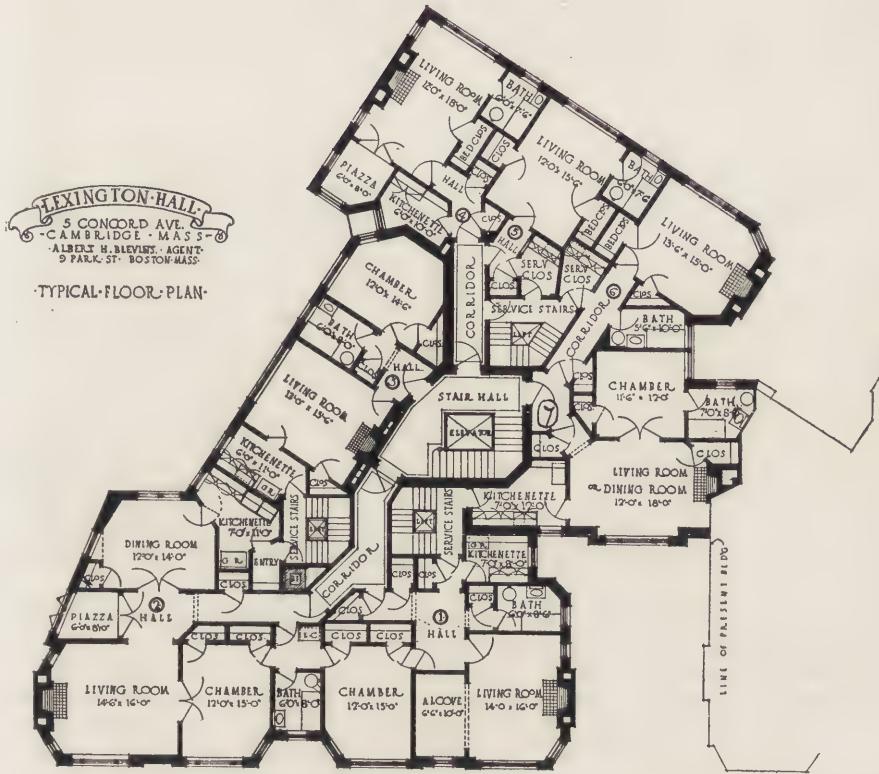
TYPICAL FLOOR PLAN—LEXINGTON HALL, CAMBRIDGE, MASS.
